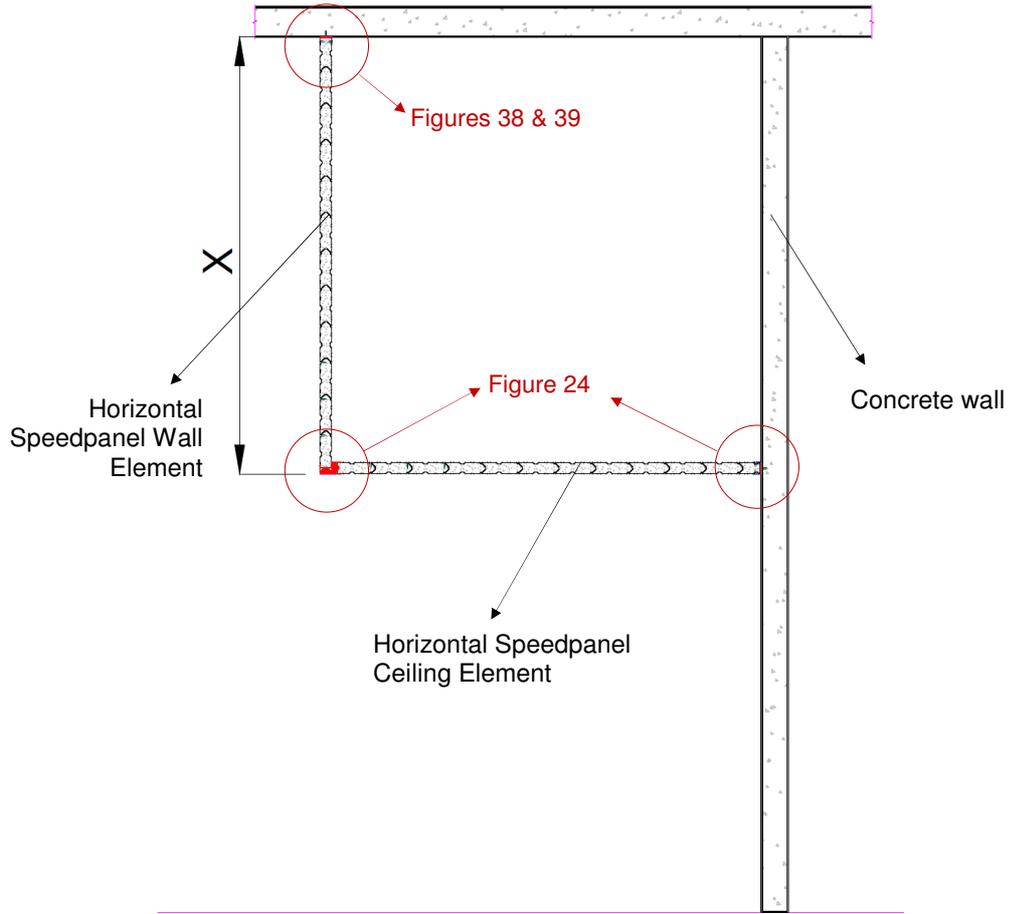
Speedpanel Bulkhead Configuration (Section Elevation View)
